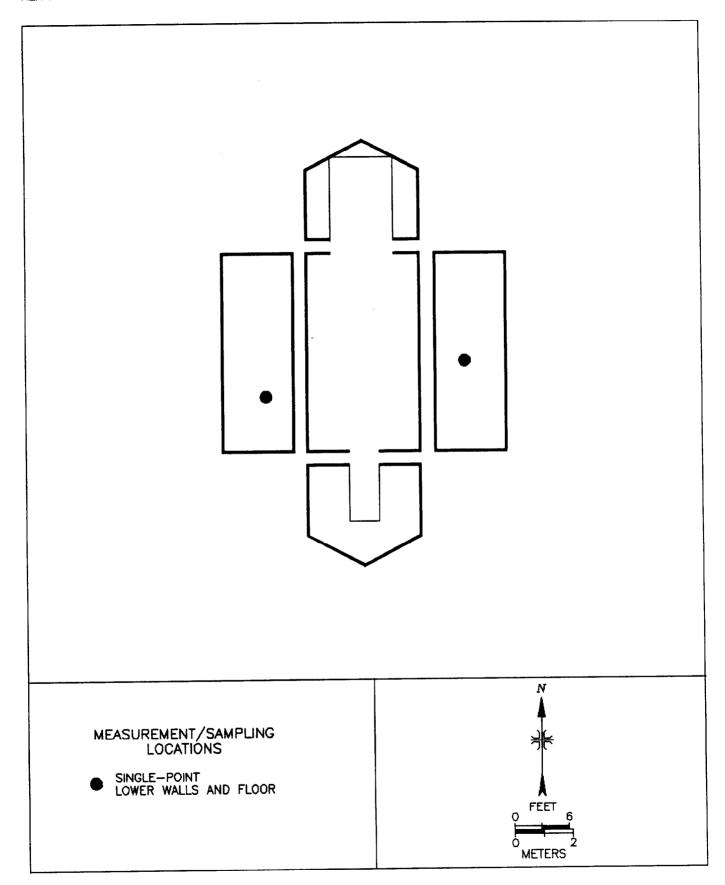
Metal Shed Outside (East) of Building 8 — Measurement and Sampling Locations
